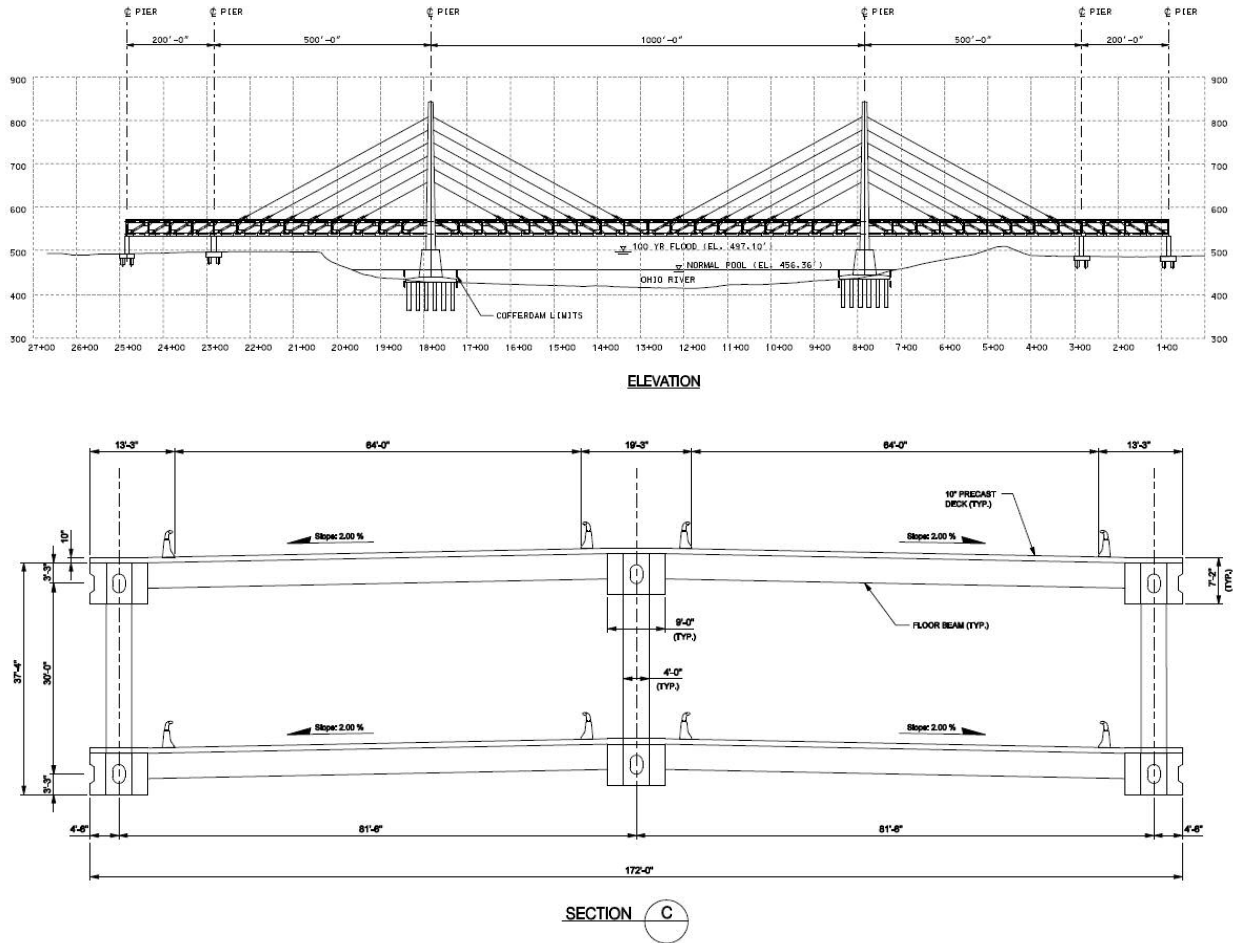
Alternate 3 – Two Tower Cable-stayed Bridge
